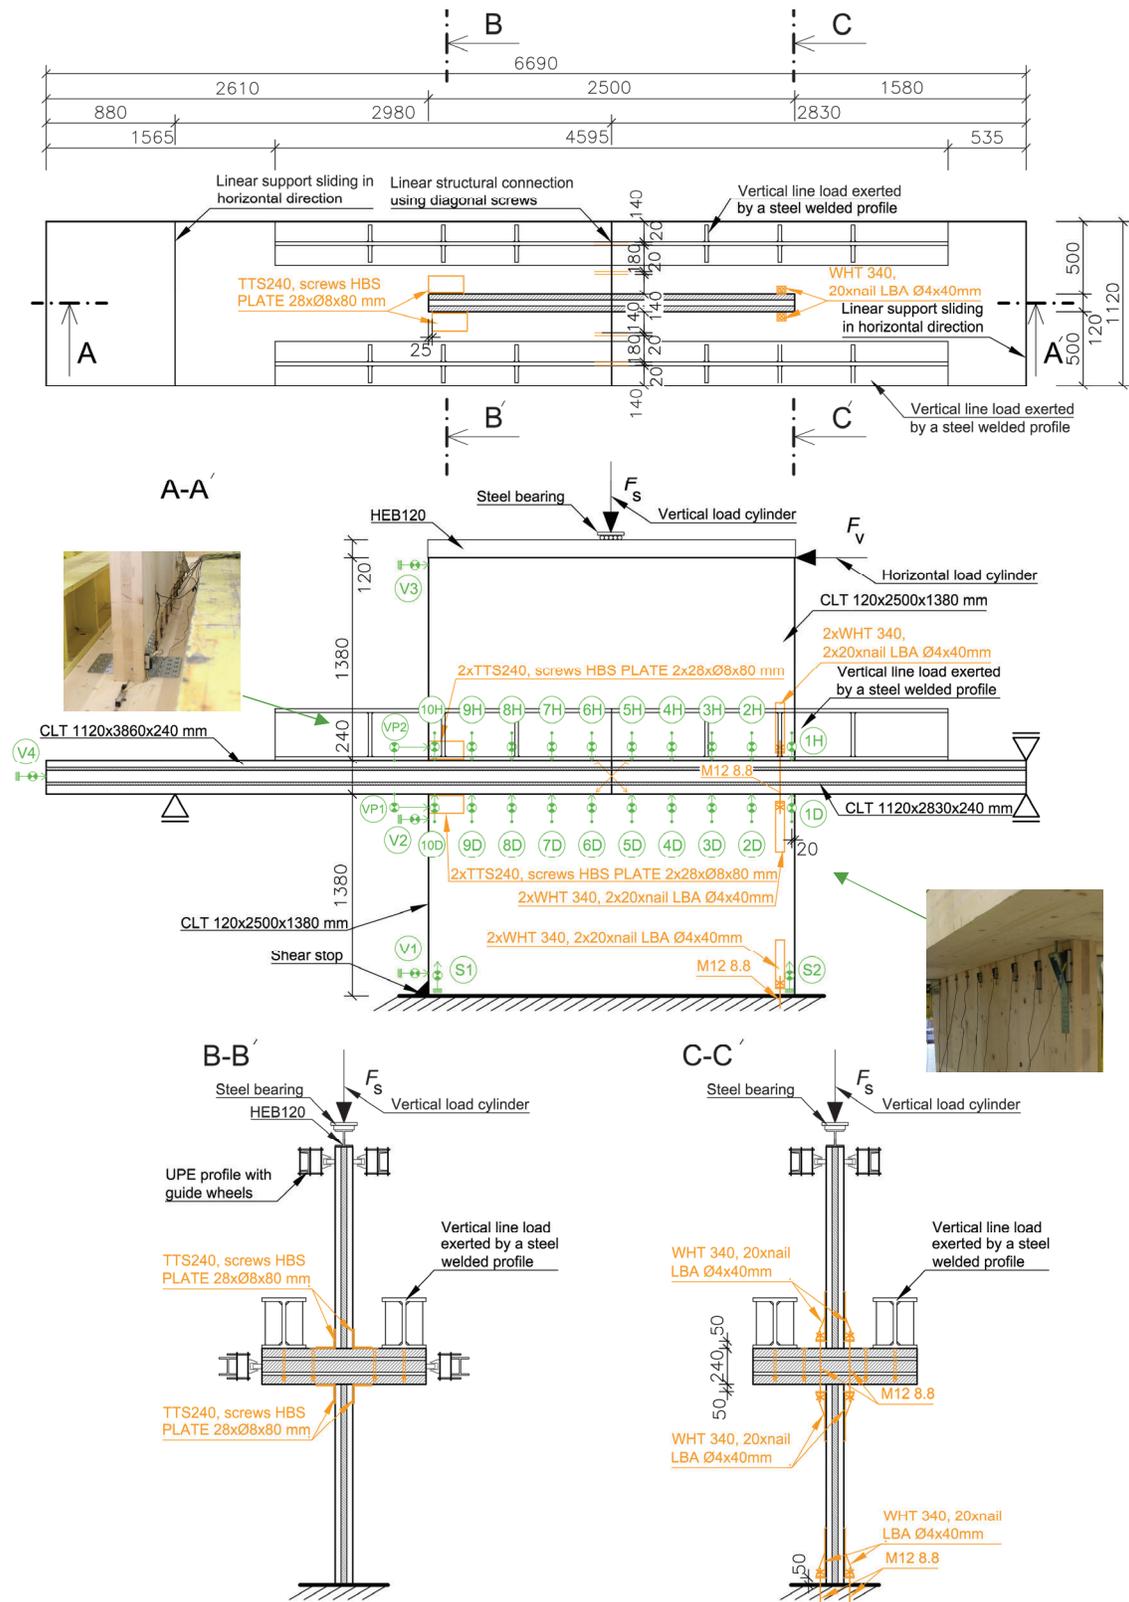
Wall to floor connection: scheme of the test set-up with display of anchoring and connecting elements (orange color) and sensor positions (green color).
